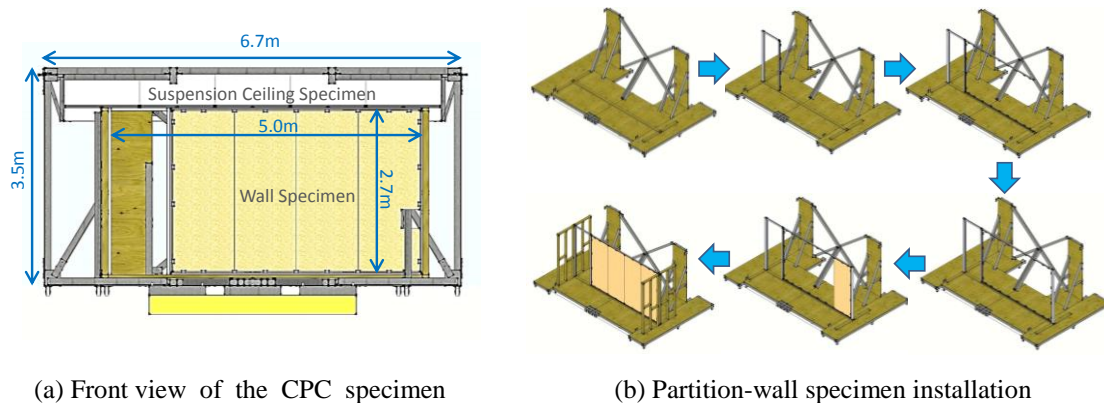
The testing Ceiling Partition Coupling (CPC) specimens
